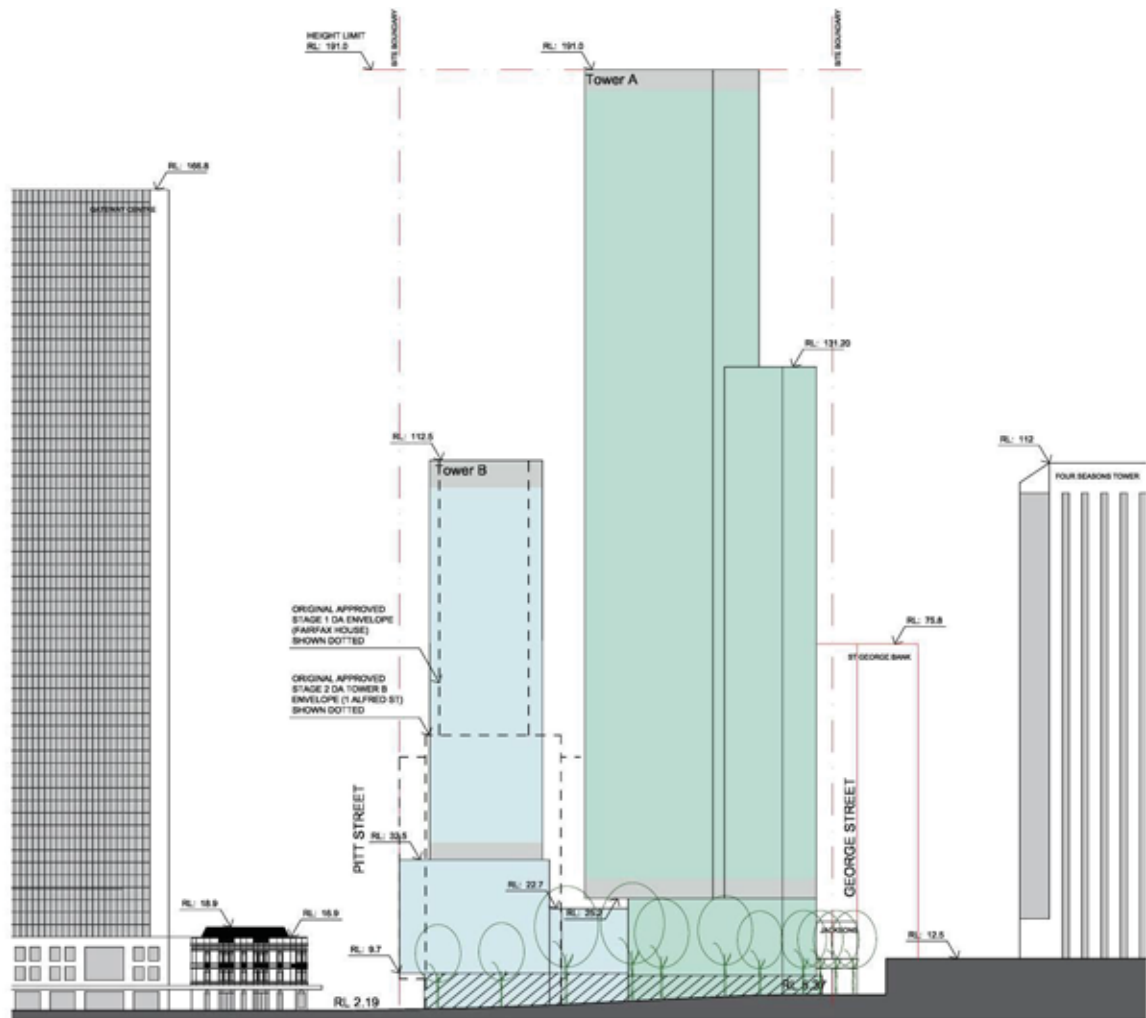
Proposed revised building envelopes, north elevation (Source: Applicant's RtS)
